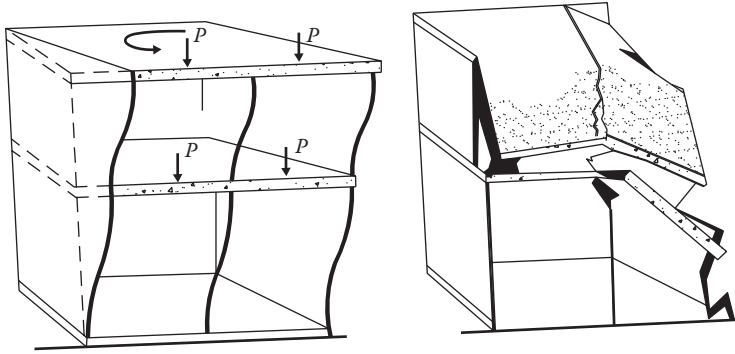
Torsion effect: unsymmetrical placement of walls can lead to collapse.
